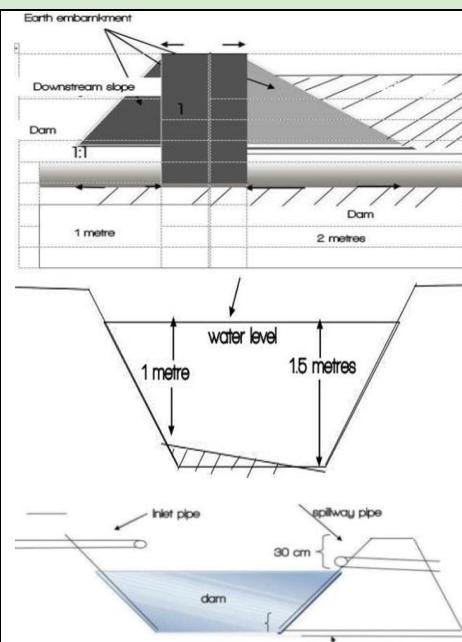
Typical cross-sections showing embankment, slopes, and pipe placement
